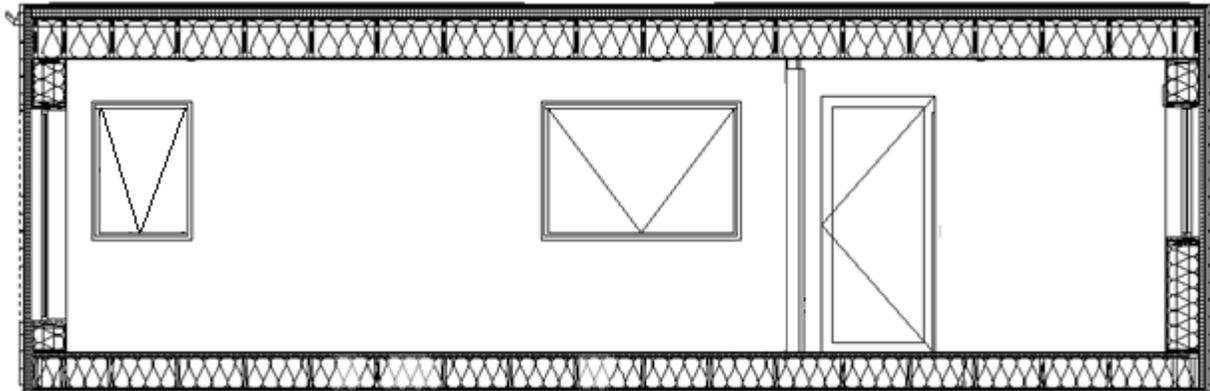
Original ΔT90 House, Longitudinal Section⁷
